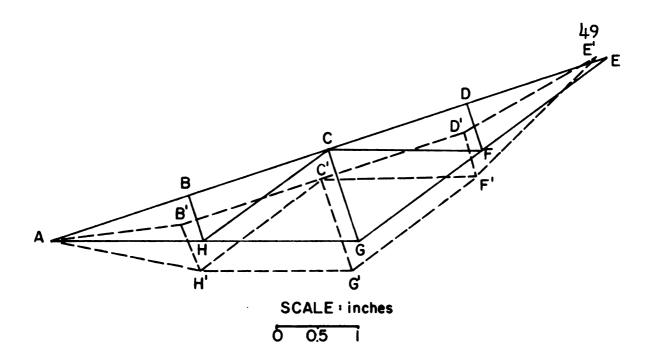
THEORETICAL DEFLECTION OF TRUSS "A"30 POUNDS PER SQUARE FOOT LOAD ON TRUSS TRUSS SPACING IS 4 FEET ON CENTERS.
